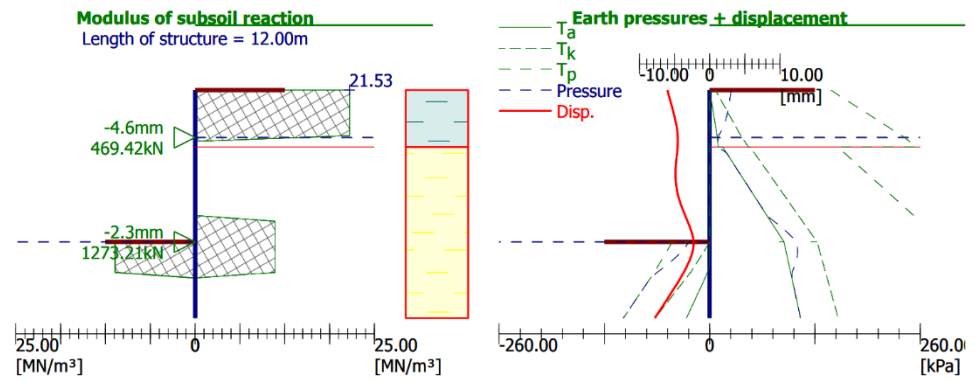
The pressure on the retaining wall of the foundation pit slope.
